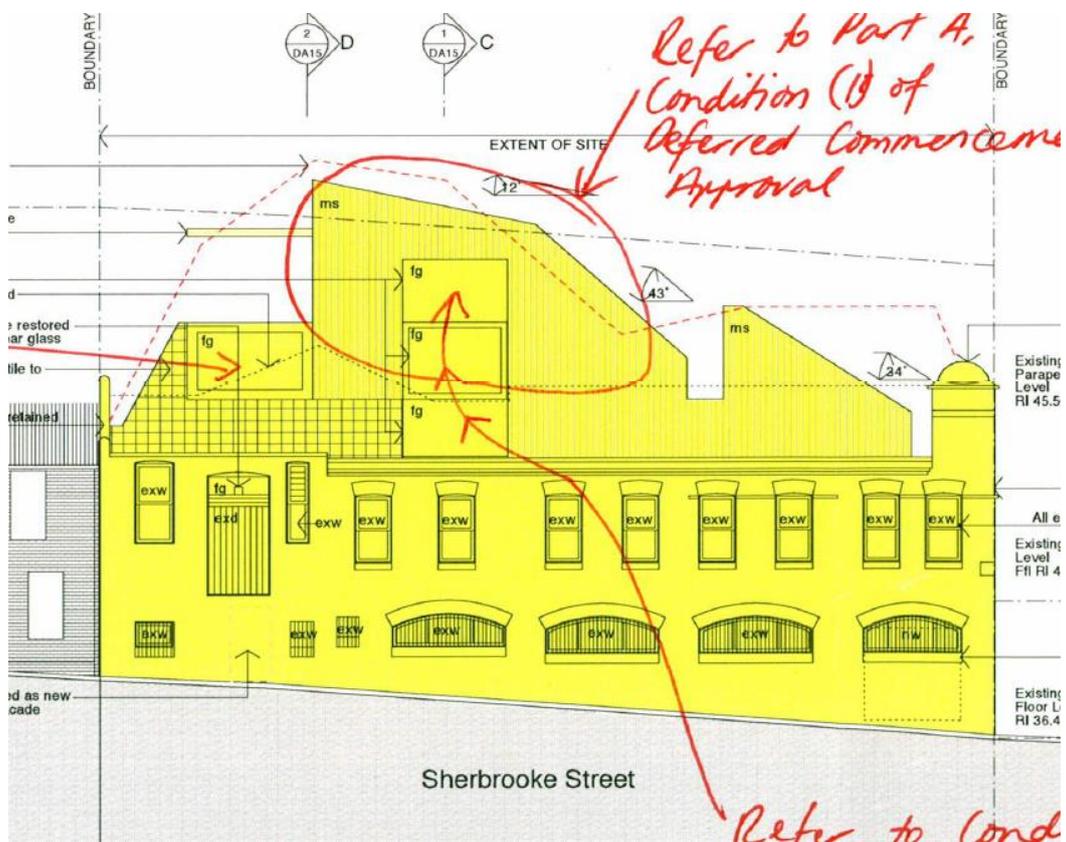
Extract from stamped plans - D/2009/1123 - showing area to be redesigned to minimise overshadowing
